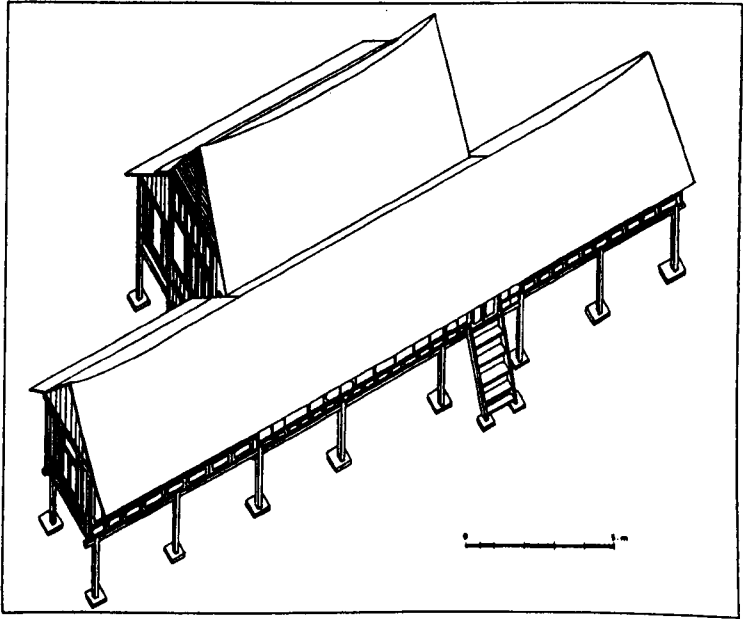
A typical example of *Minangkabau* roof with attic.
